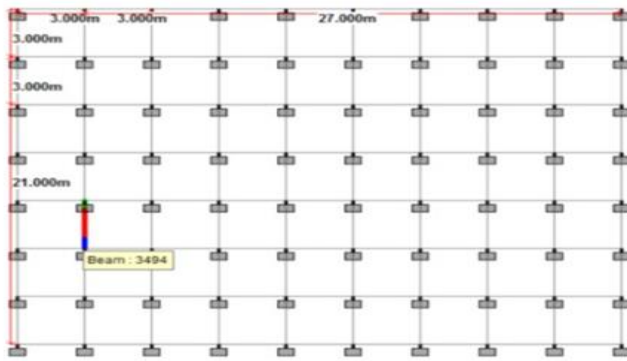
3D Elevation and plan of of Rectangular Building
